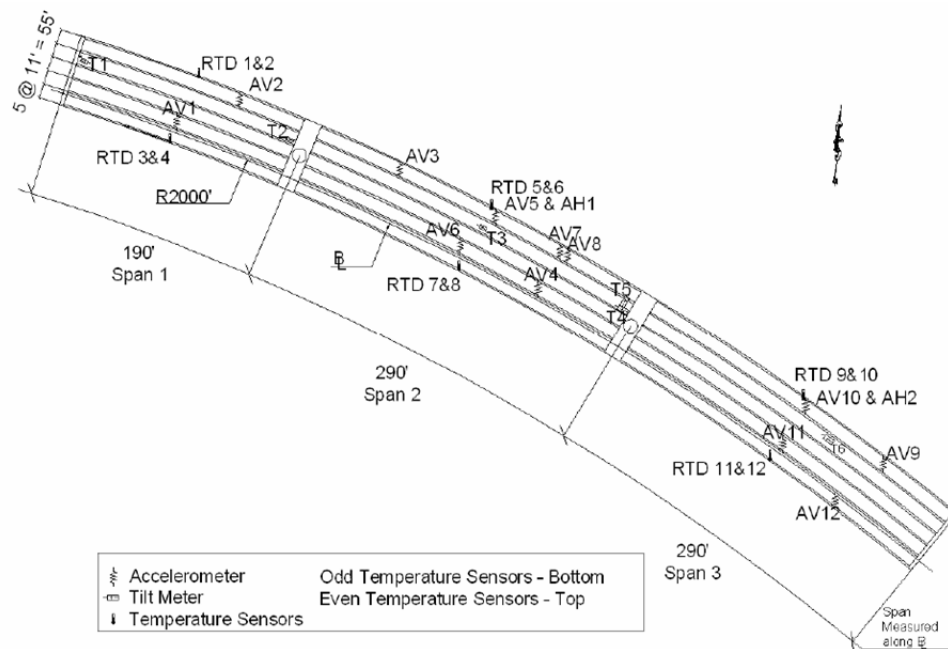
Sensors locations for post-tensioned box girder bridge (DeWolf et al. 2006)
